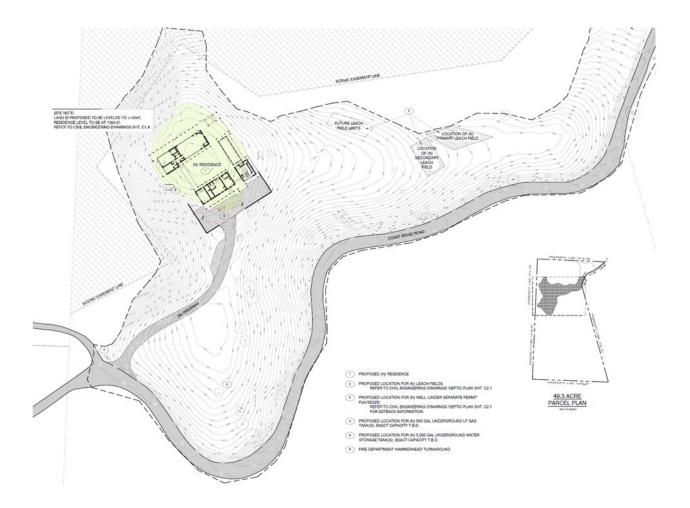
Site Plan – Layout of the proposed single family dwelling on the subject parcel (Source: IX.1)
